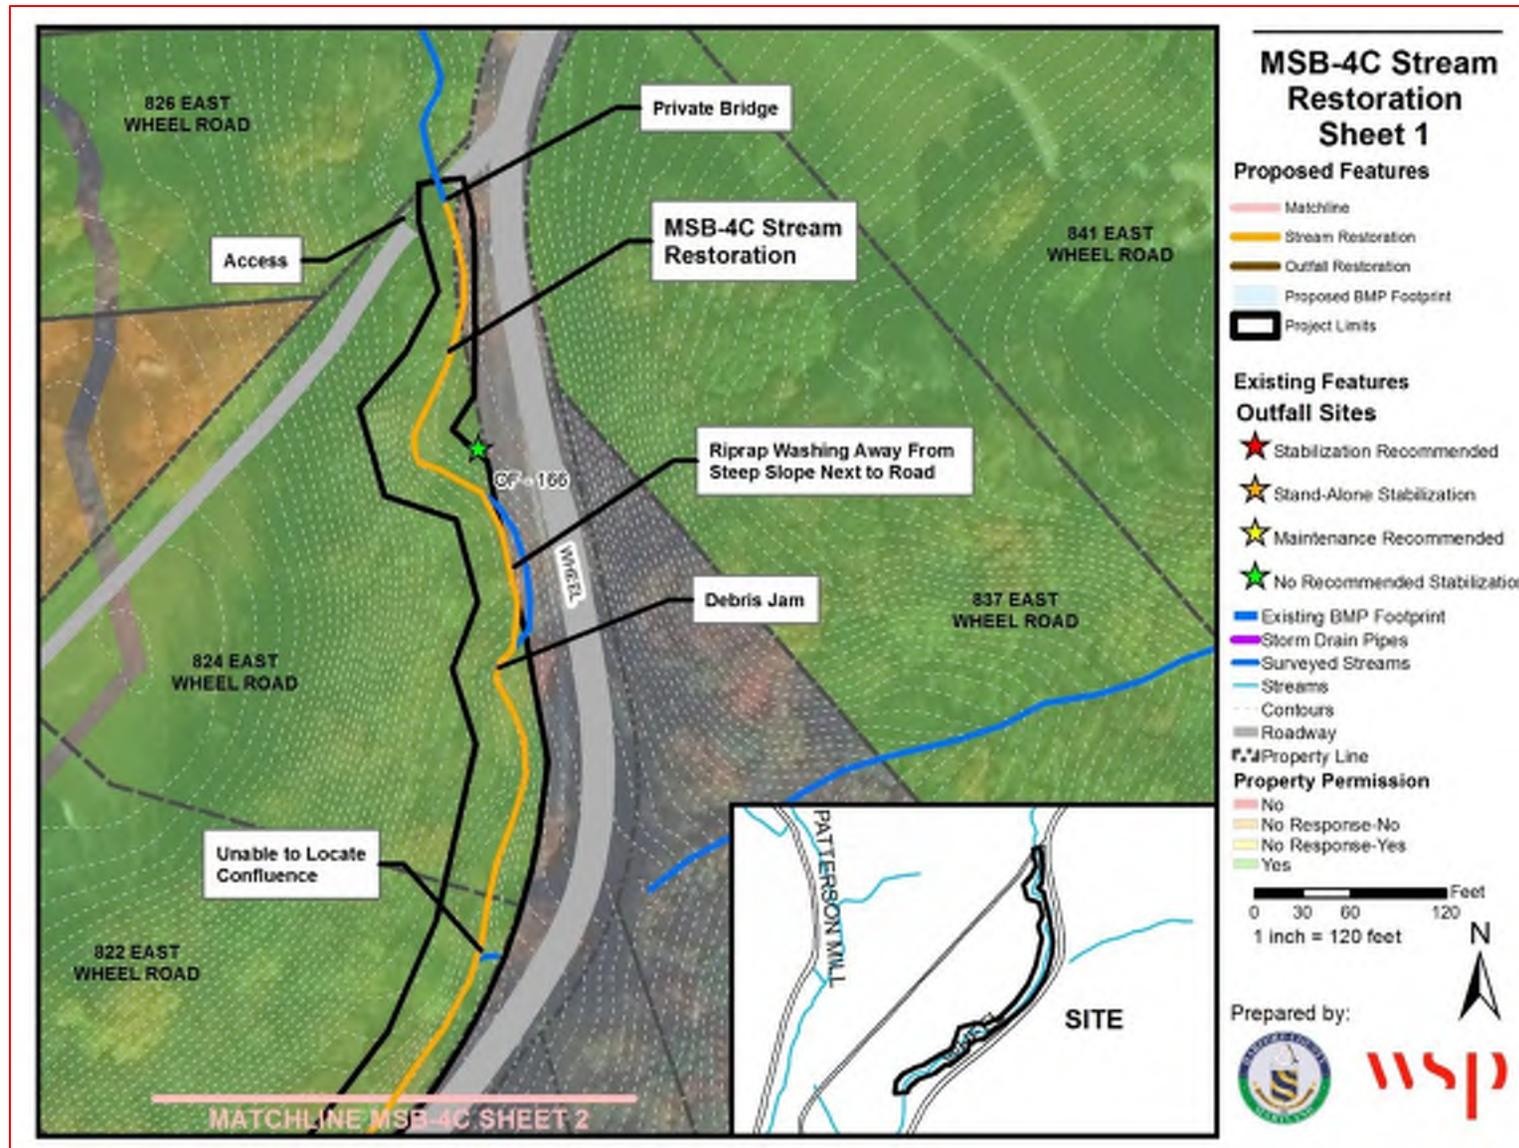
Site Location and Proposed Project Plan for MSB-4C Stream Restoration (Sheet 1 of 2)
